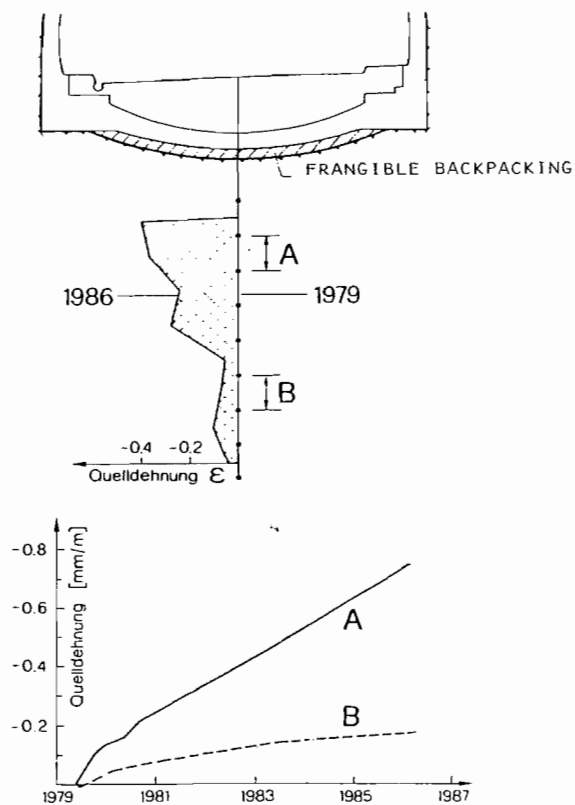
Design of tunnels in swelling rock; passive approach.
